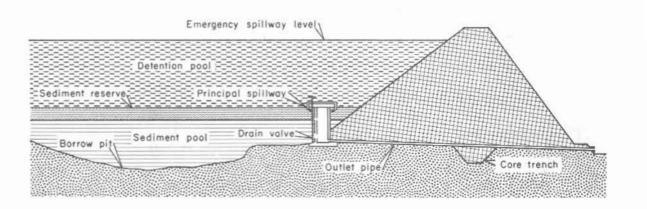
Section of a Typical Floodwater-Retarding Structure With Outlet Works
